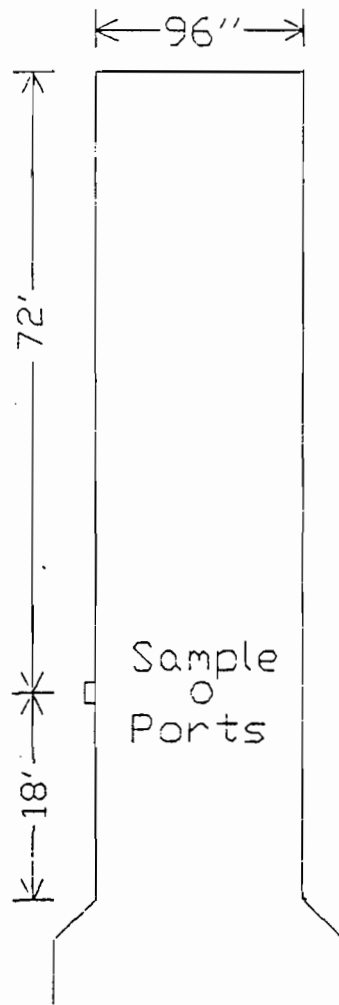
Stack Dimensions and sample port locations, Fort Pierce Utilities Authority, H.D. King Electric Generating Plant, Unit 7. Fort Pierce, Florida.
